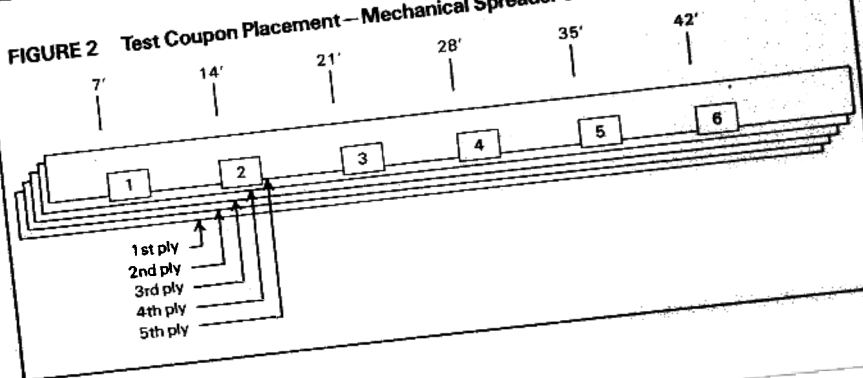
Test Coupon Placement — Mechanical Spreader Samples
